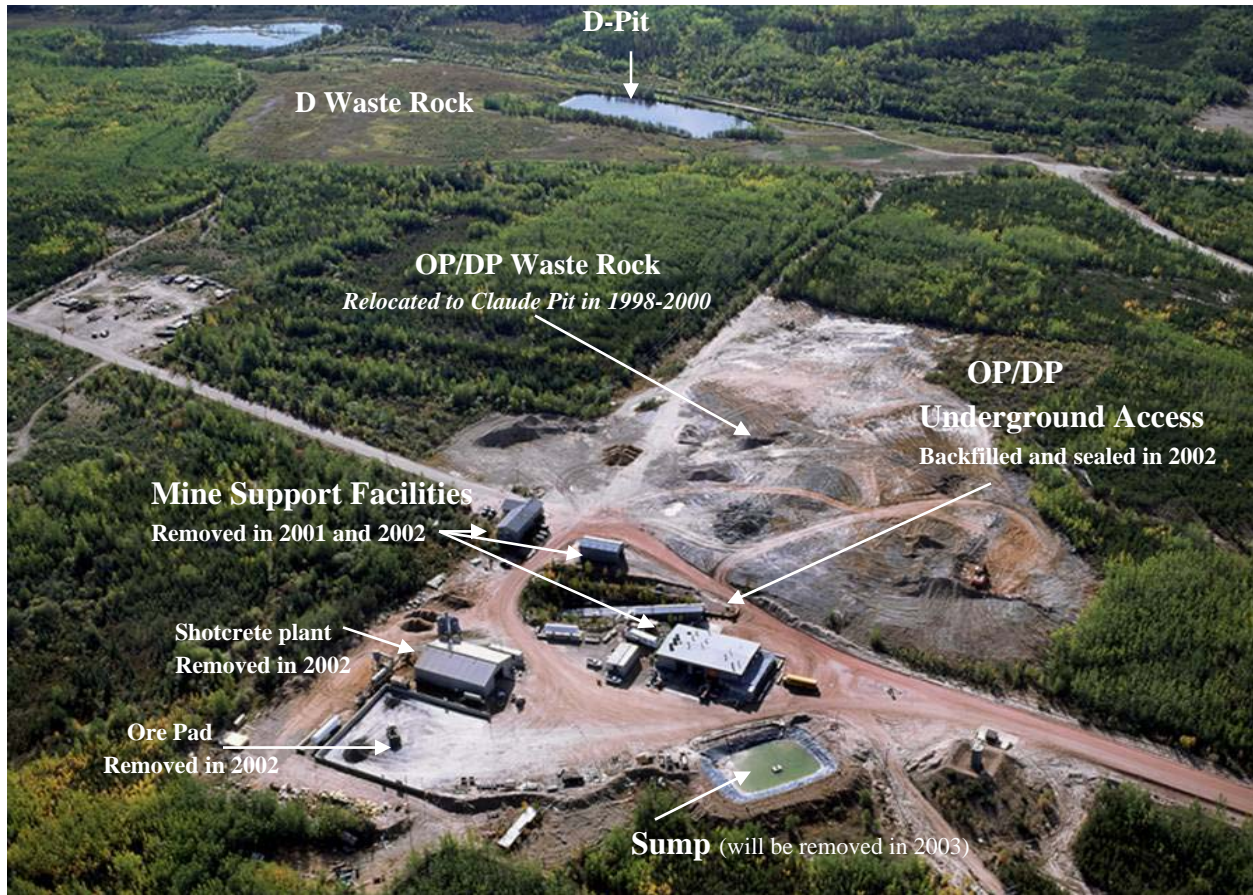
Aerial Photo of D-Pit and OP/DP Surface Facilities.
